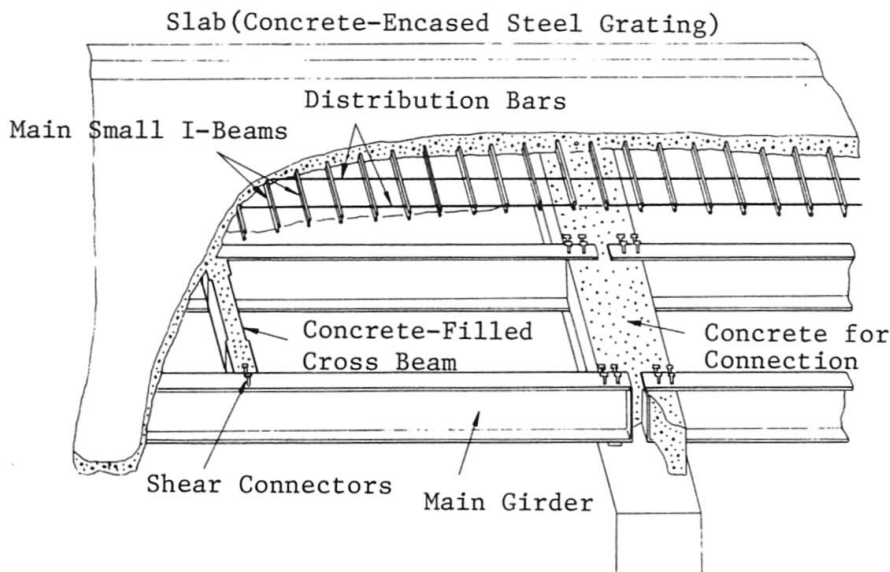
Concrete-Encased Cross Beam and Connection of Simple Girders
